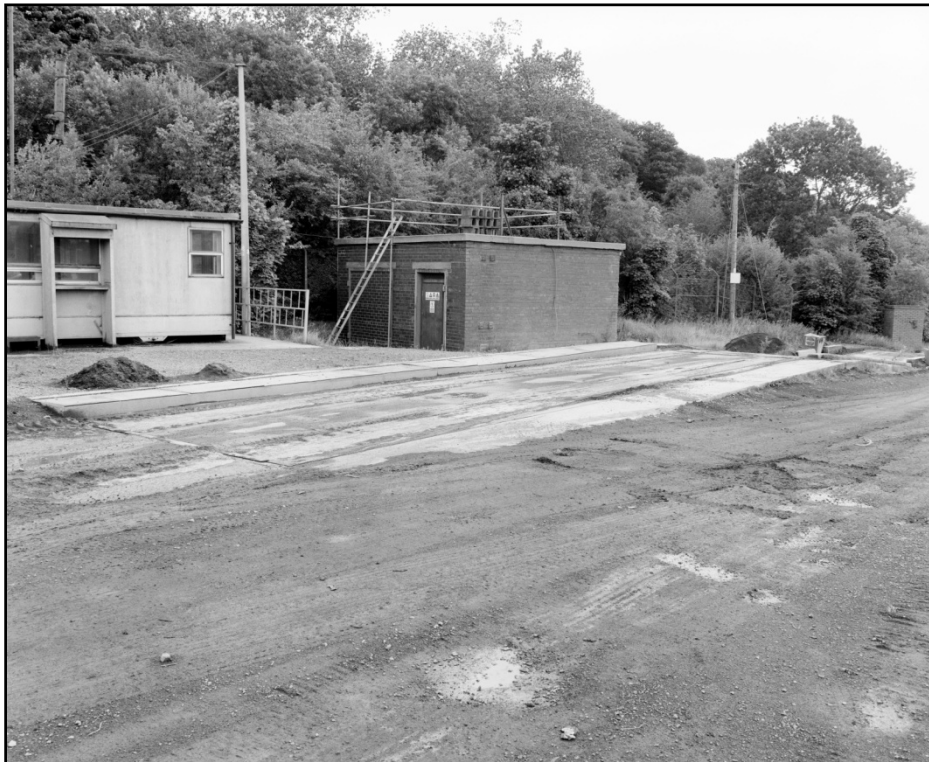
General view of west elevation of building A6 (film 15:9)
